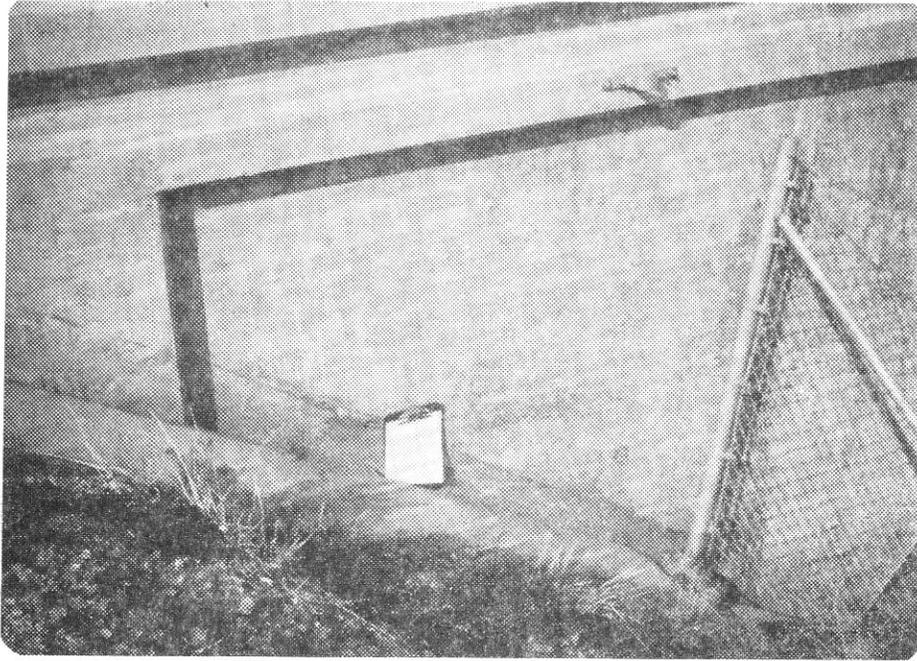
Wingwall at Roxford Street Undercrossing. Note fill settlement relative to structure as delineated by staining on wall.
